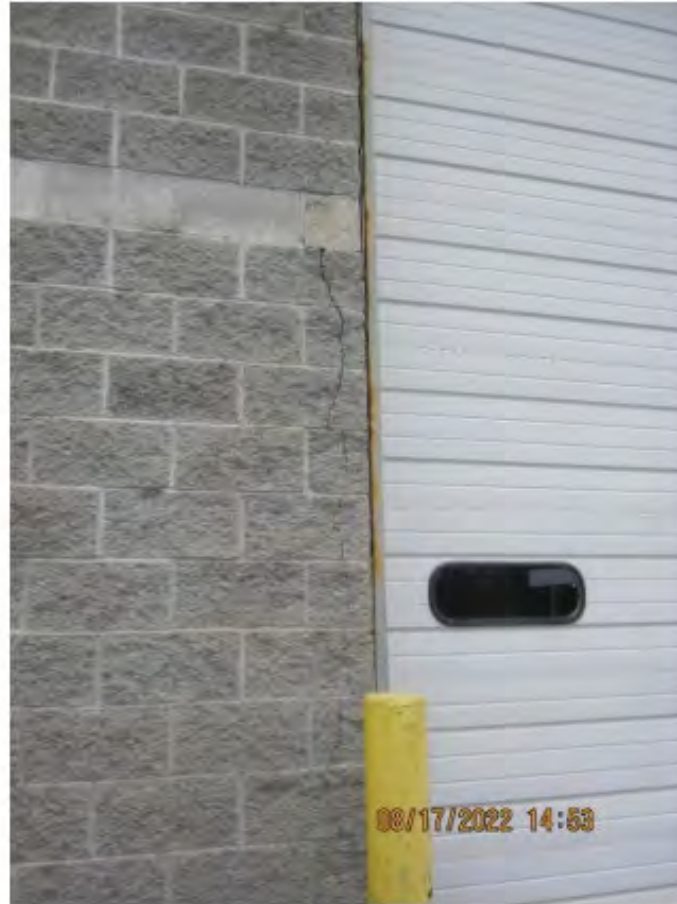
Crack in Masonry Wall, Looking East
